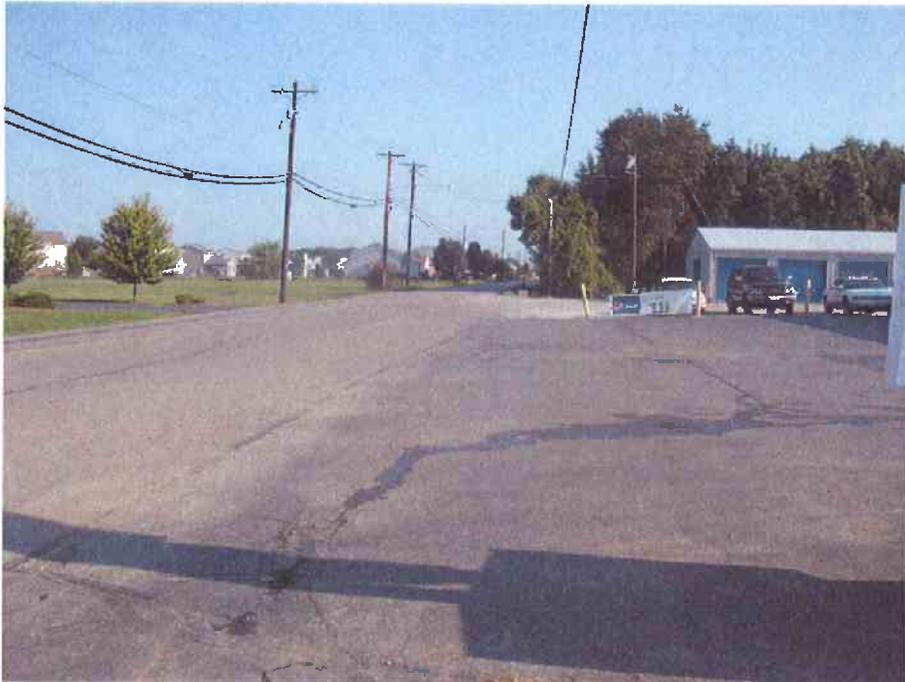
Looking North along Long Street at poor access control adjacent to gas station
